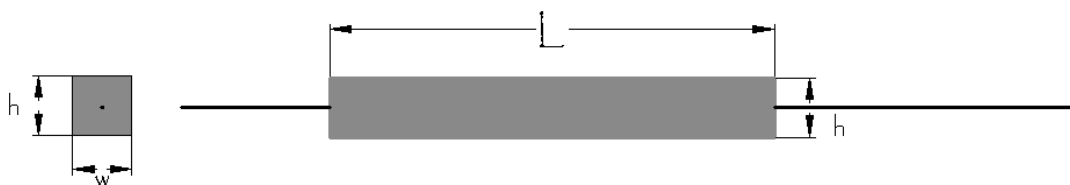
Schematic view of prismatic tension specimens with reinforcing bar
